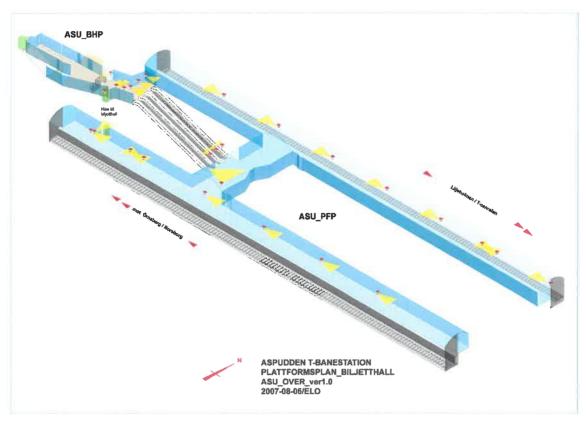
shows an example of the typical SL metro station infrastructure, with the first floor as the platform and at the second floor the exits are located.
